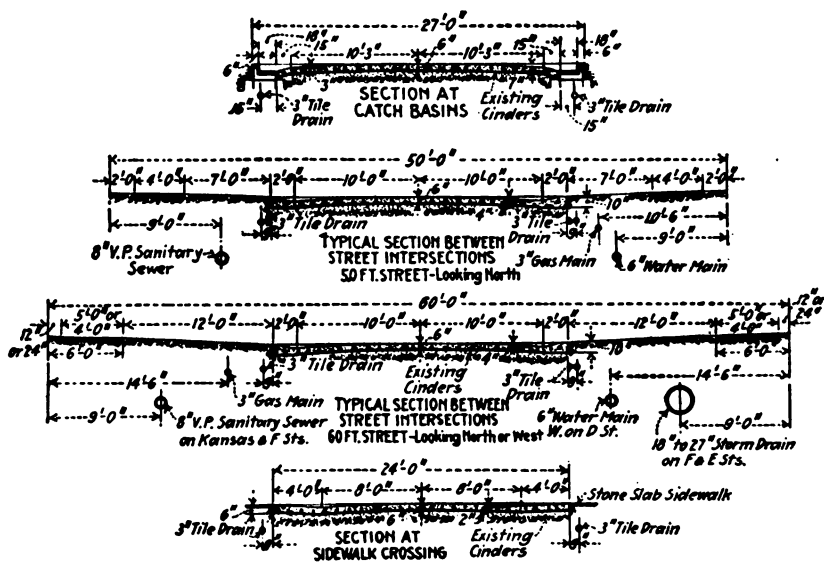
Details of street improvement and sub-structure location; Lorain Project of the Emergency Fleet Corporation.
